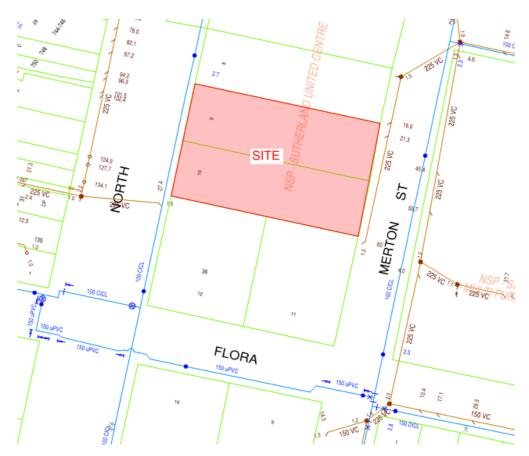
'Sydney Water' Hydra Plan – 100mm dia. Water Main in Merton Street serving property
